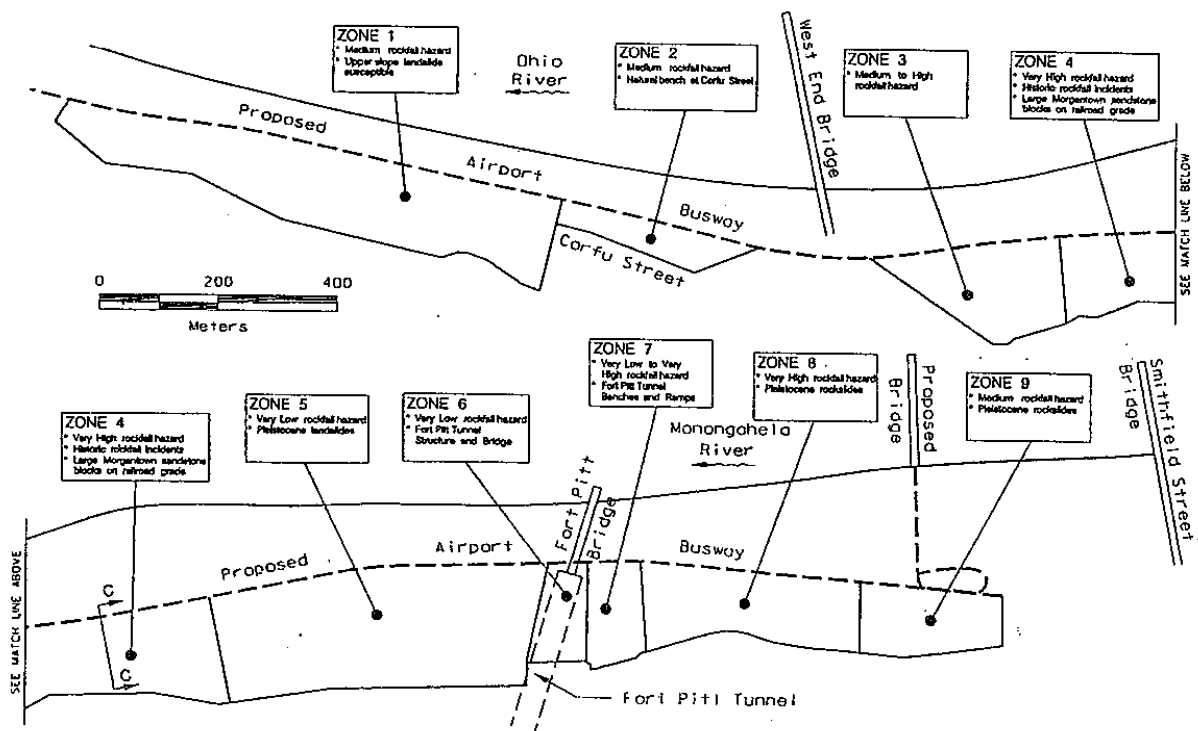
Plan of Proposed Pittsburgh Airport Busway
